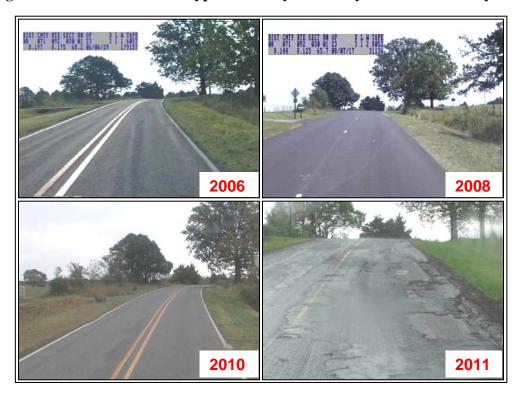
Deterioration of a Typical Facility in the Fayetteville Shale Play Area
